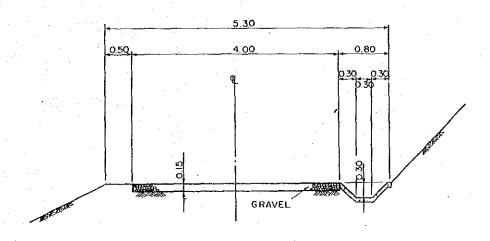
Plan of Road Rehabilitation and Construction
